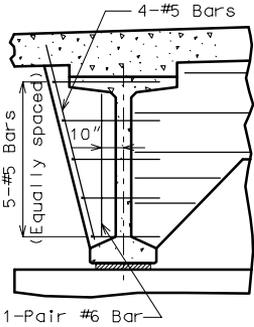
DETAILS OF COIL TIE RODS IN BULB TEE GIRDERS
